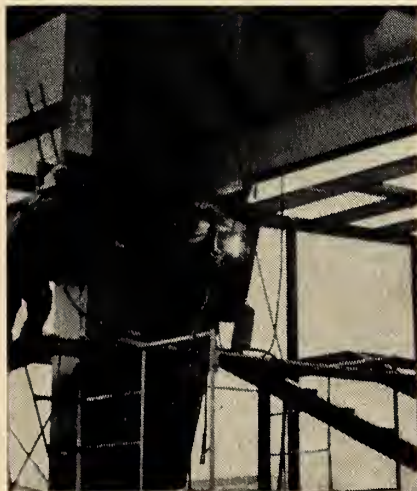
Manual welding of diaphragm plate in the 20 ton welded girder beam, Saskatchewan Power Building, Regina.
